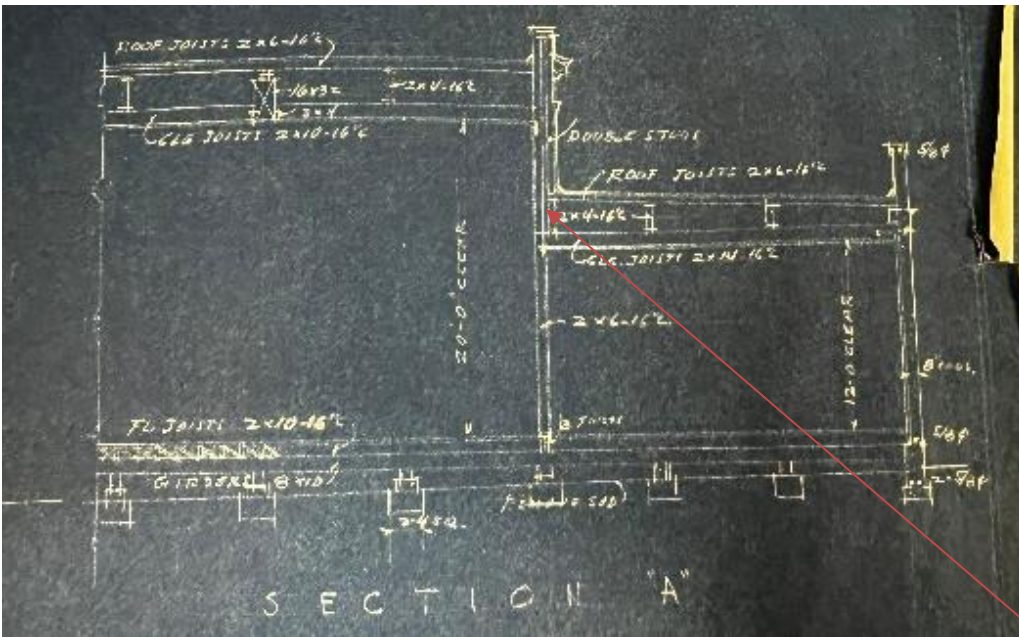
Original Blueprint. Indicates a building cross section looking north.
